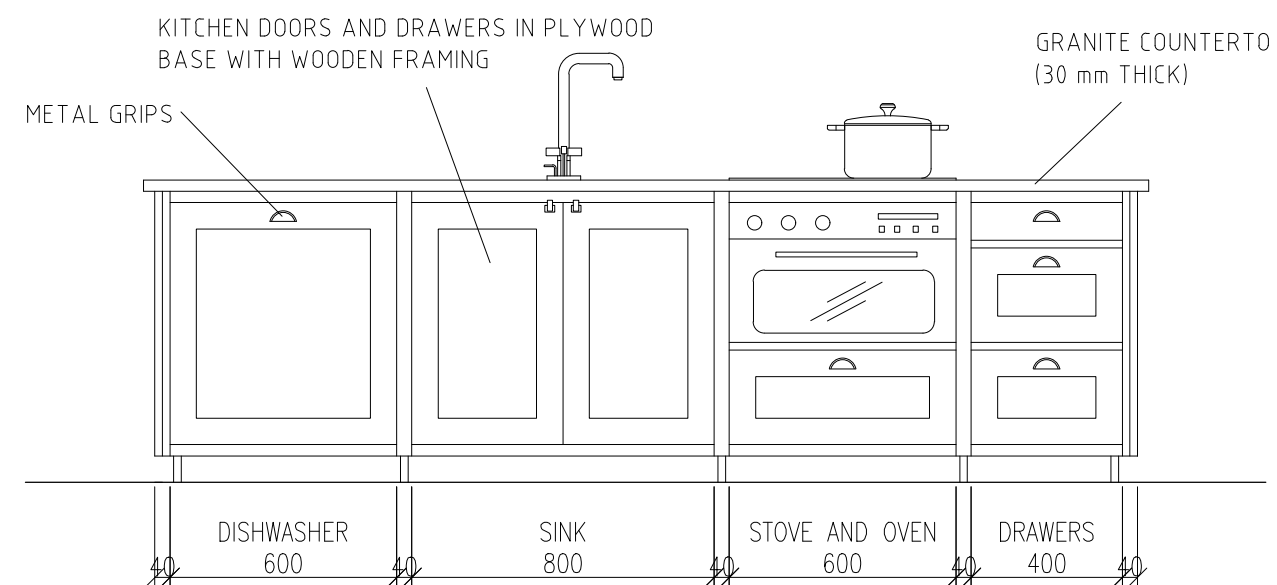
Kitchen front elevation, ground floor. Scale 1:20.
